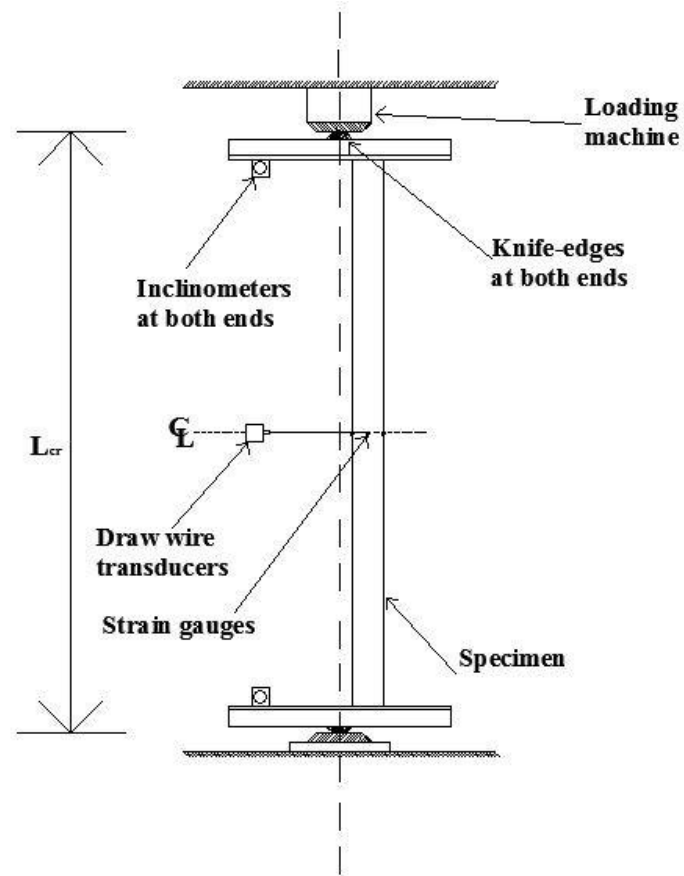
Tested specimens arrangement: Schematic view (Law and Gardner, 2013)
